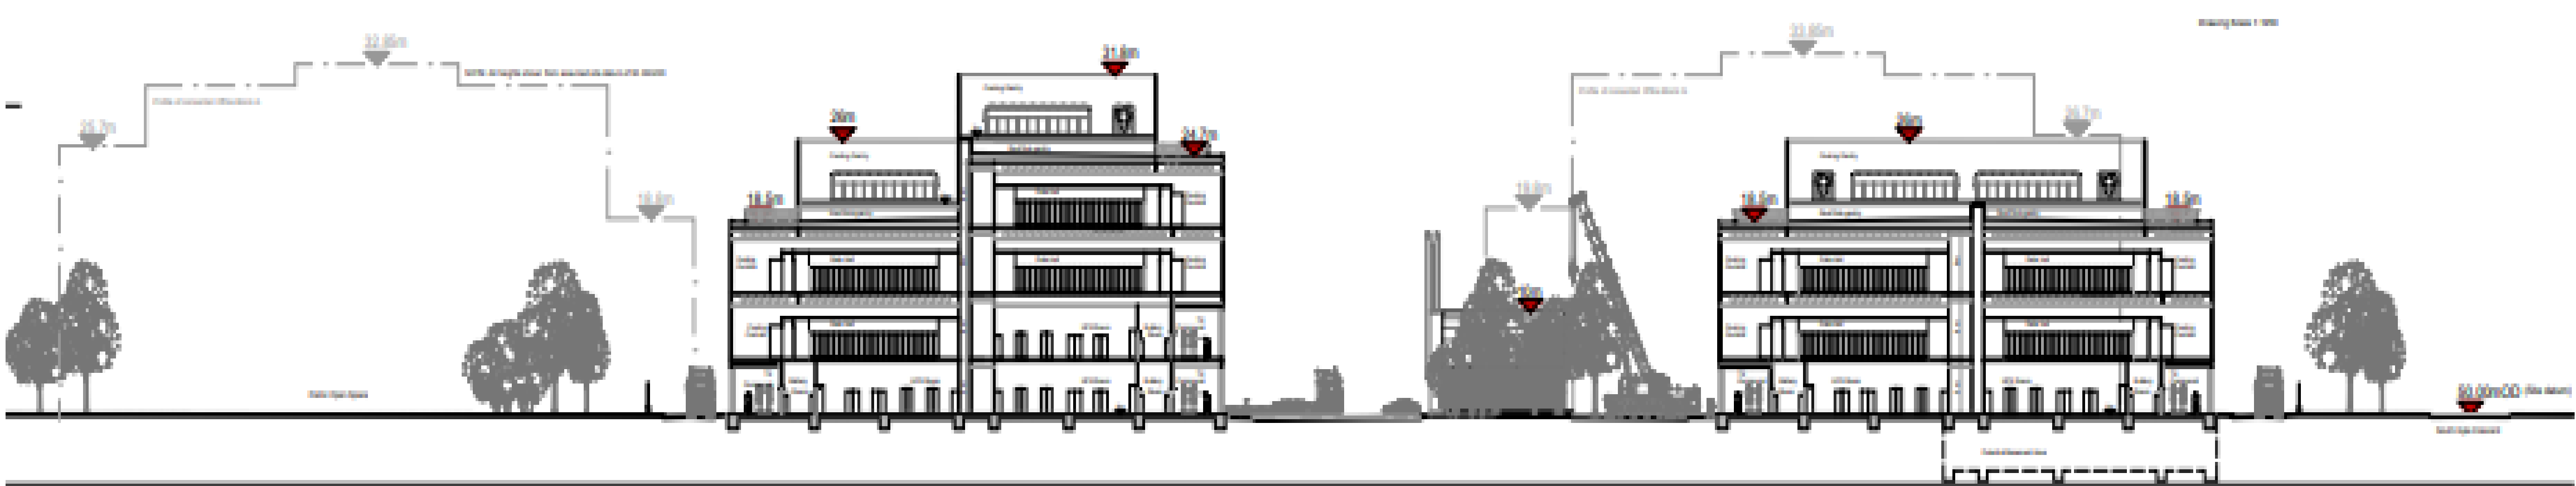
Proposed illustrative Site Sections : Source : studioNWA Architects
